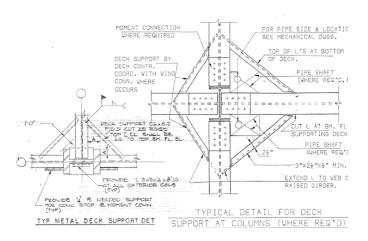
Typical detail on Sheet S24A of Cantor construction documents showing allowance for openings in slabs adjacent to interior columns (TISHMAN014742)
